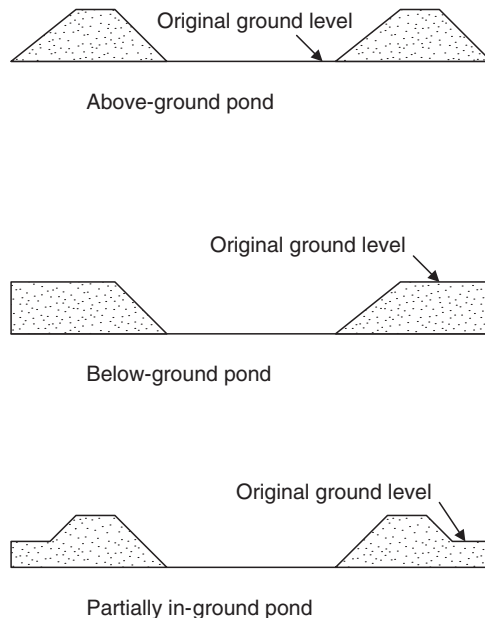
Cutaway view of above-ground, below-ground, and partially in-ground pond configurations showing the elevation of ground level prior to levee construction.
